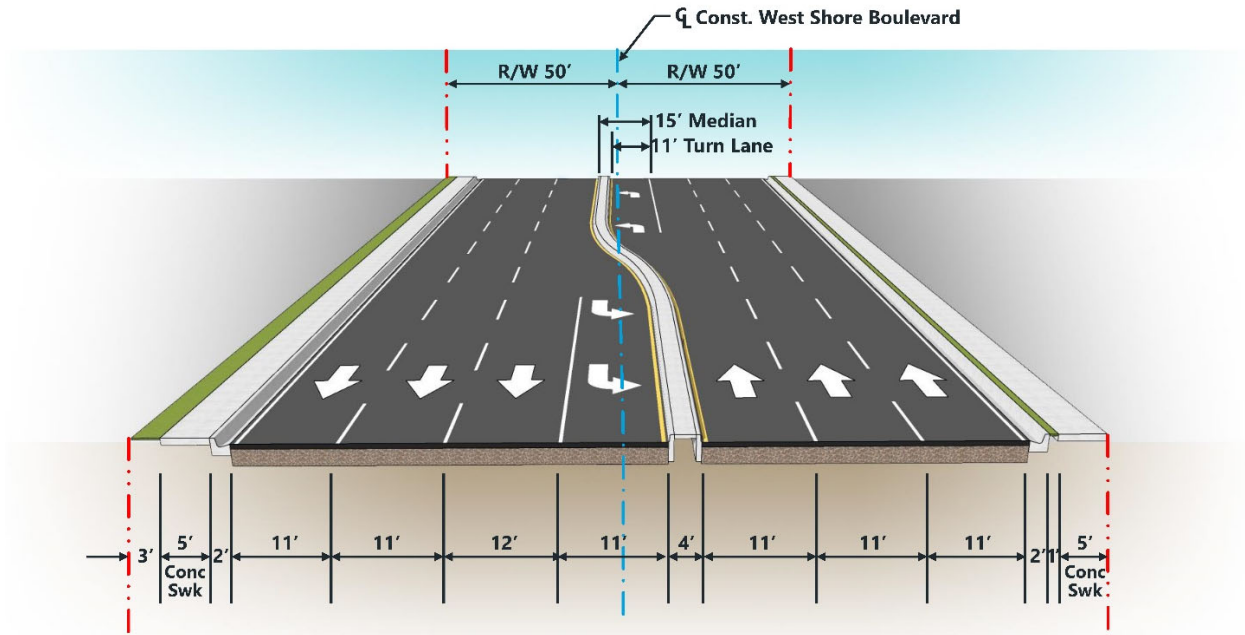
Existing Typical Section Looking North from W. Gray Street to South of I-275 (SR 93)
